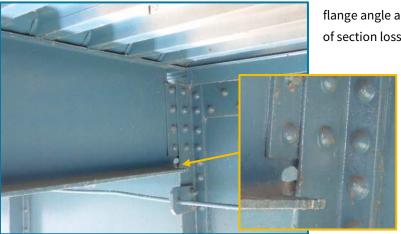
3" corrosion hole through Stringer 3 web at connection to Floorbeam 30 in Main Suspension Span (looking southwest).
